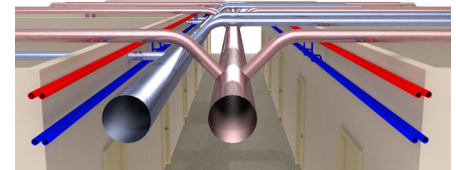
Hospital patient room hall interstitial space for an active chilled beam application (supply duct, exhaust duct, and chilled water piping).
